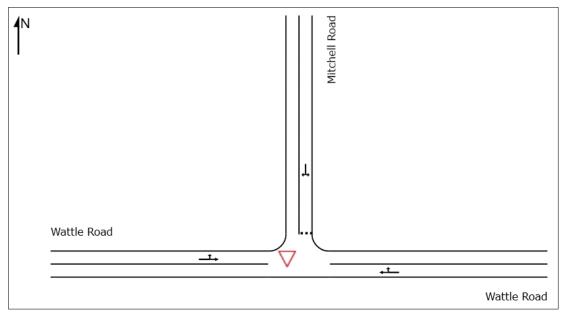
Priority Intersection Layout of Mitchell Road with Wattle Road (SIDRA)
